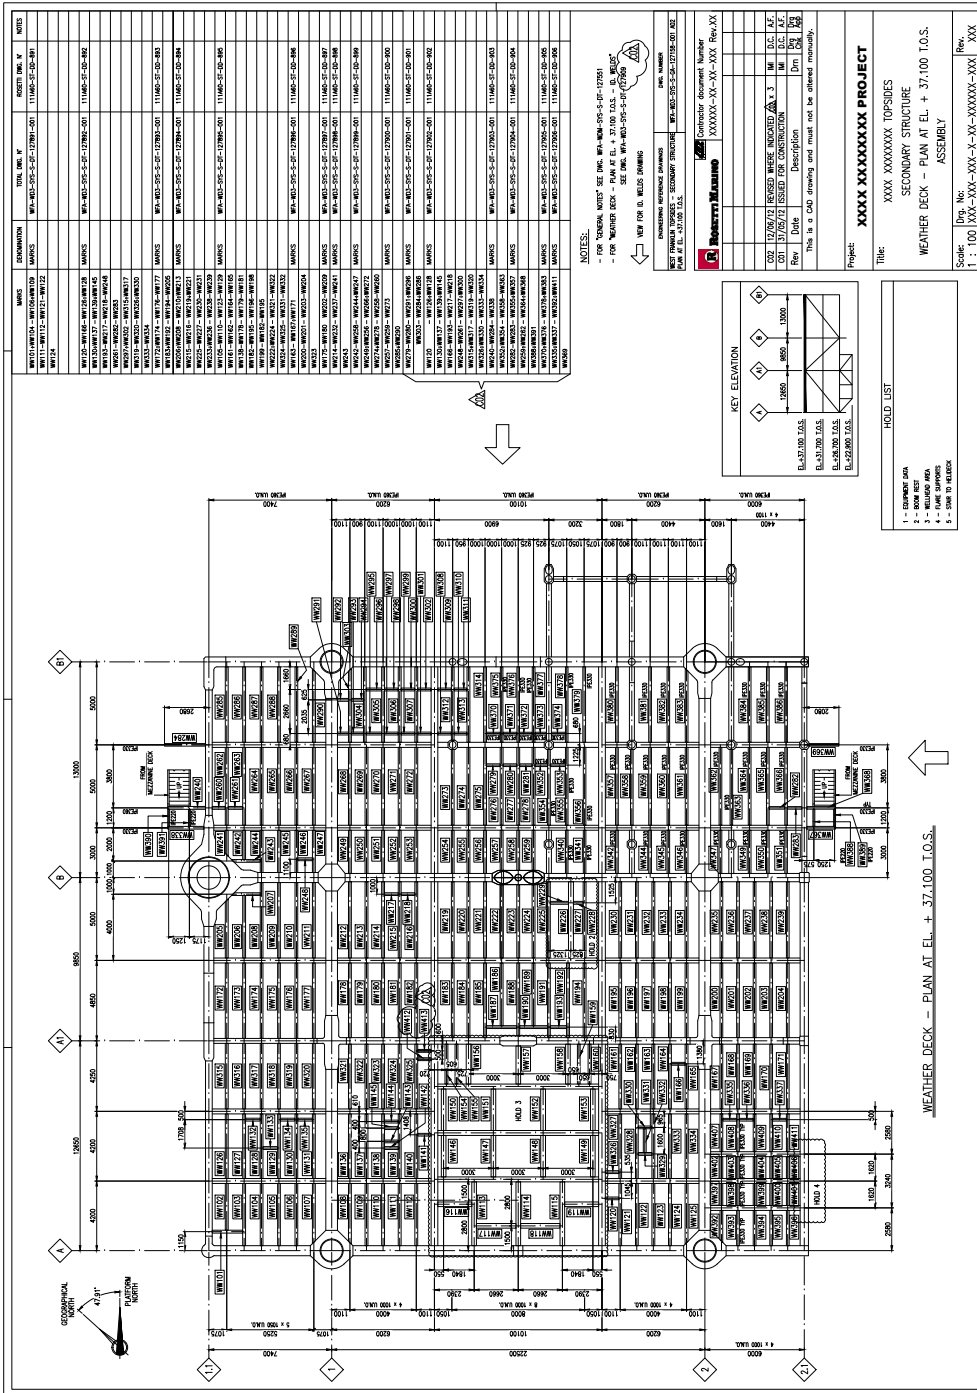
Weather level deck - Shop drawing - Plan view - Secondary structure
